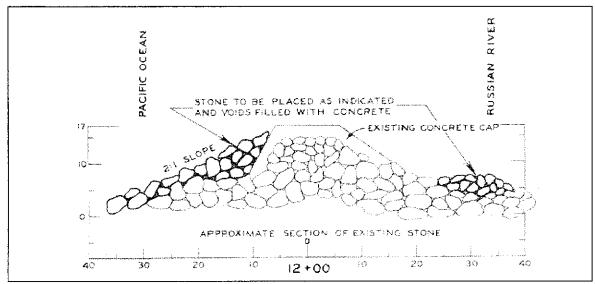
Planned Typical Cross-Section of Jetty Repair in 1948
